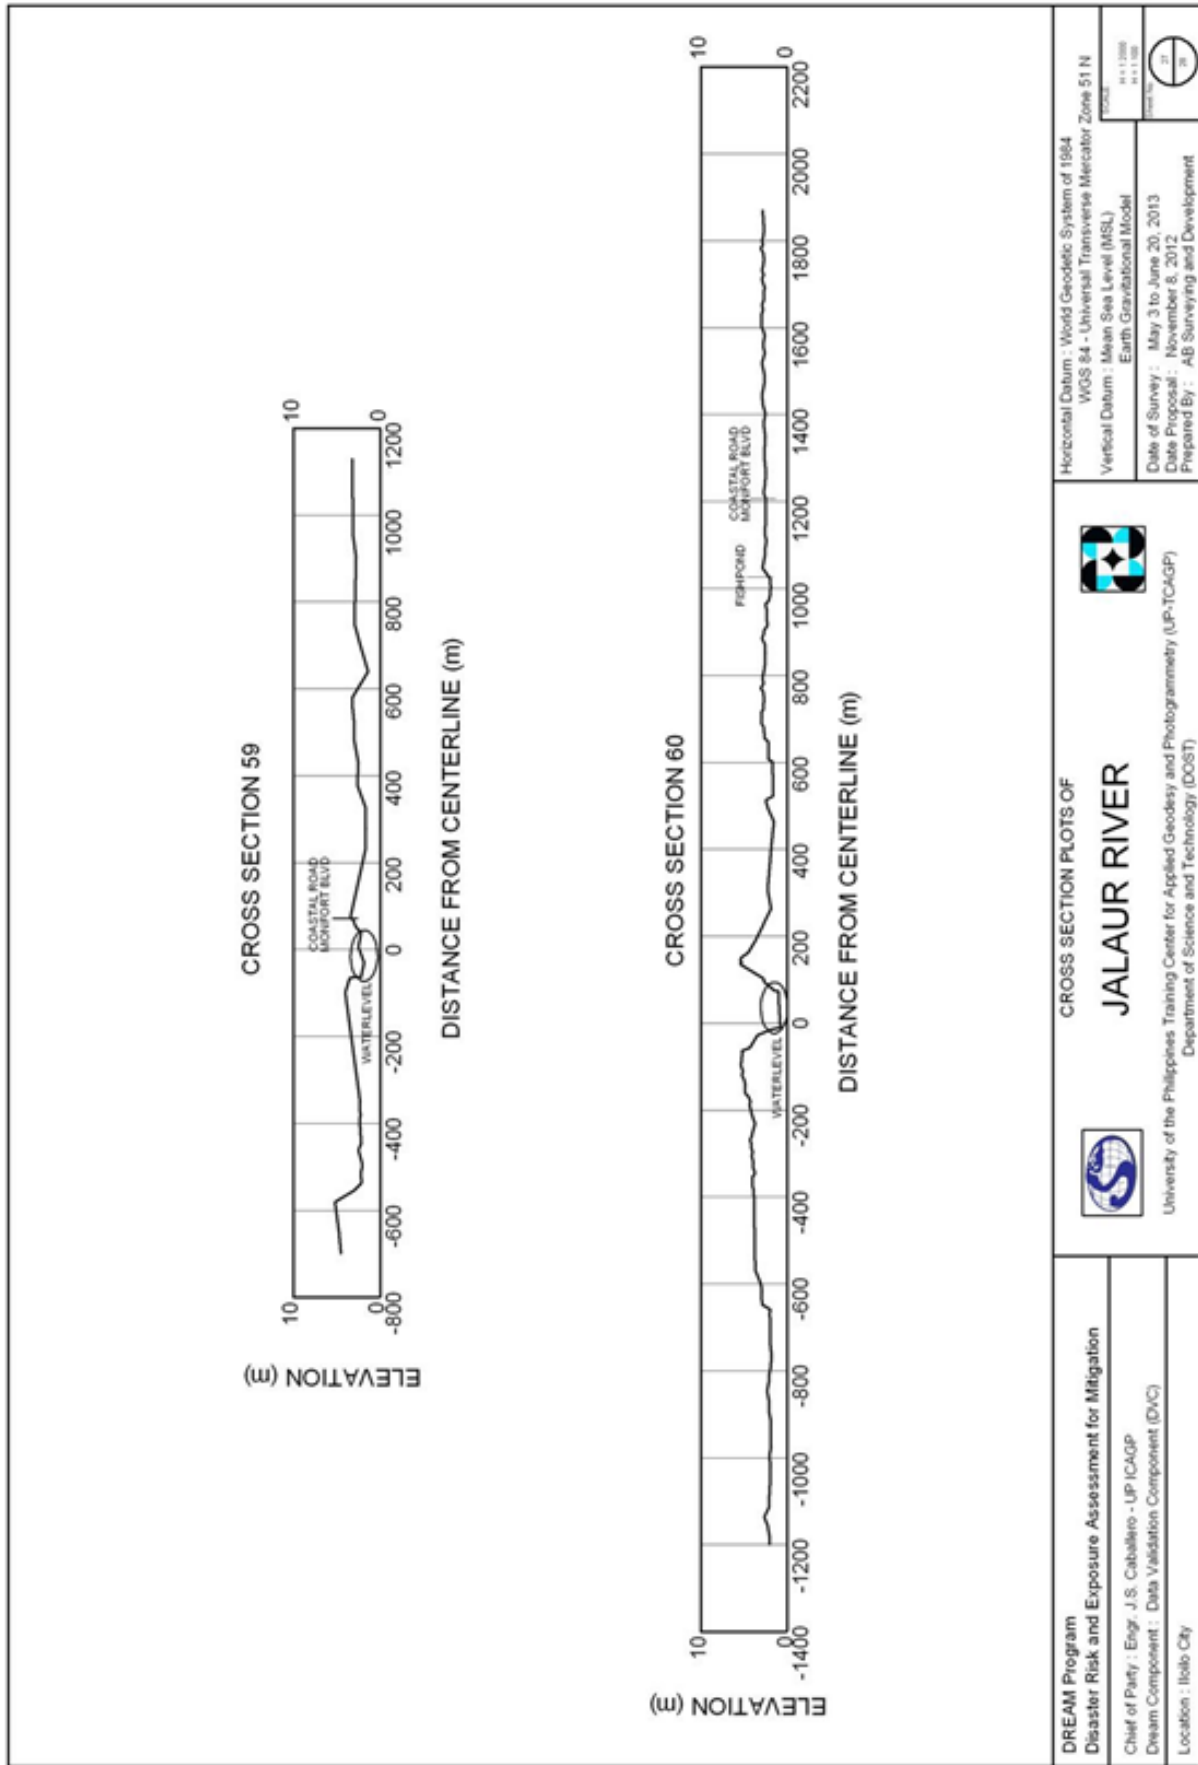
Sheet No.27 of the Cross-section plan of Jalaur River
